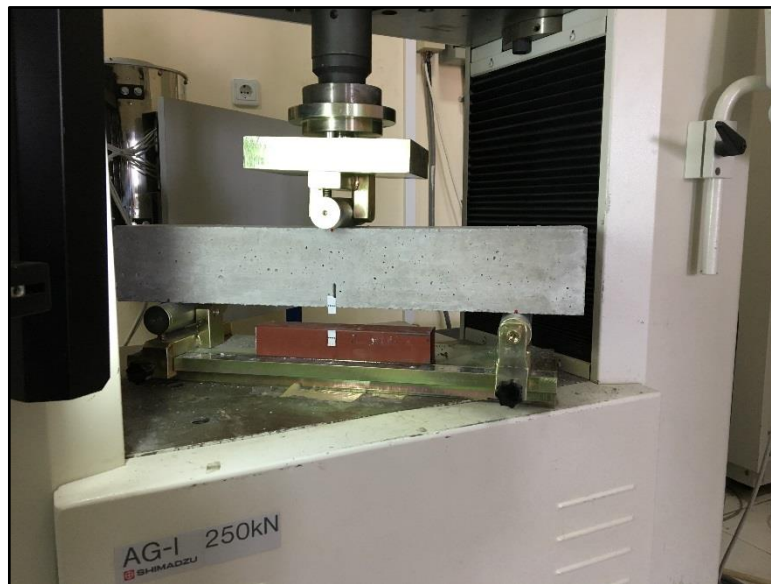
600 x 100 x 100 mm prismatic specimens for flexural testing
